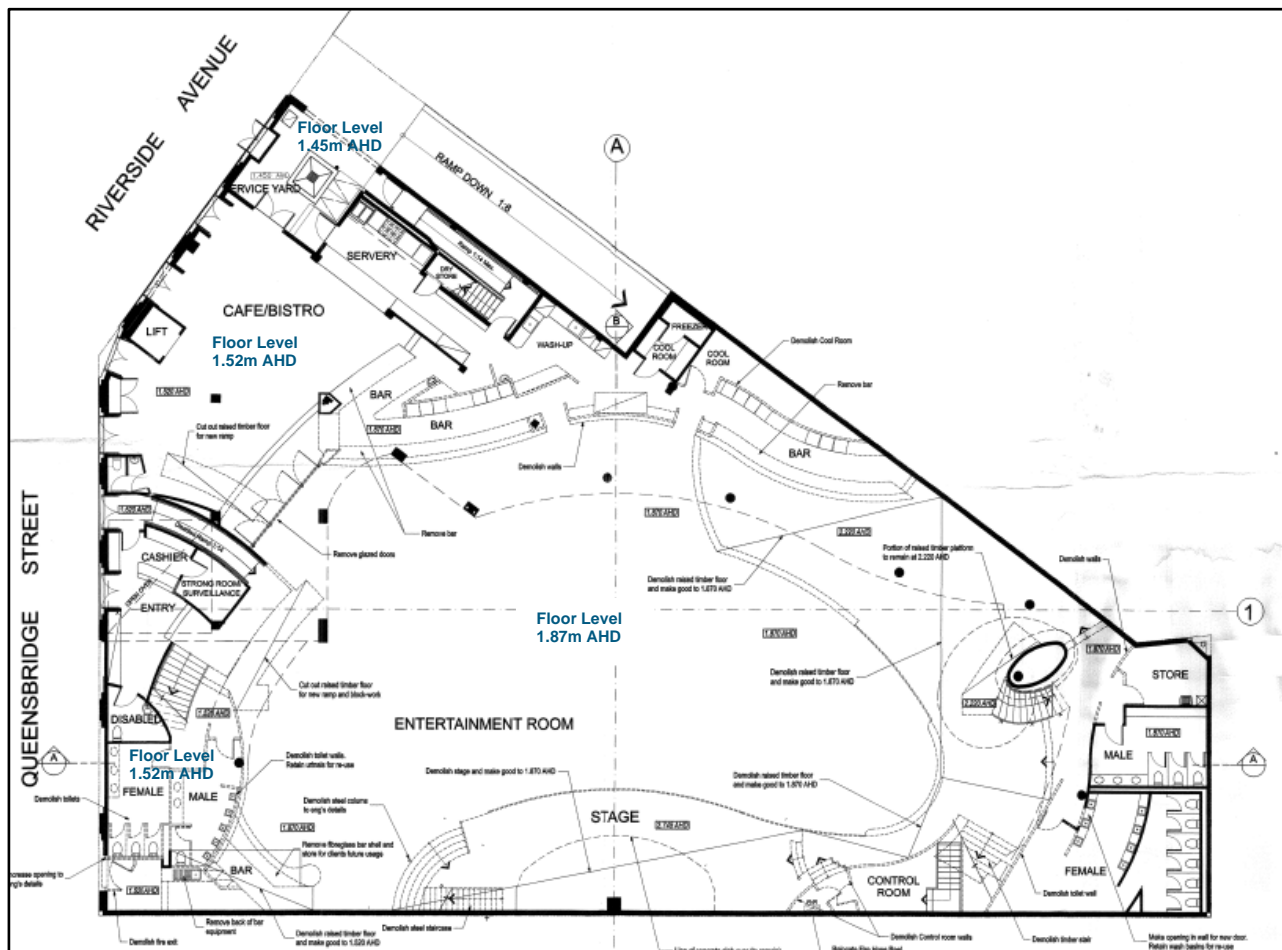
Ground Floor Plan of the Hotel – Cross-Section (Enth Degree Architects, 2005)
